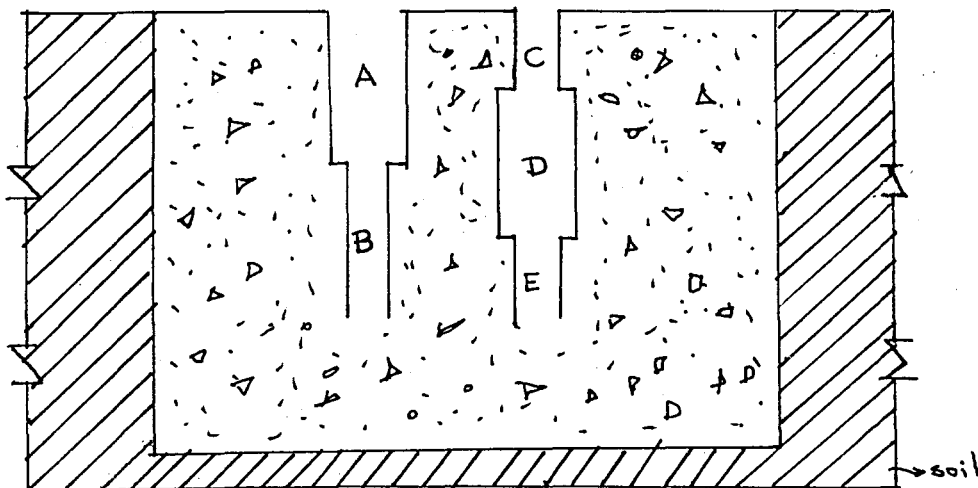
Diagram depicting a section through a concrete slab containing large pores A and D and smaller pores B, C, and E.
